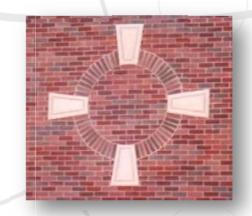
Thin Brick Precast Panel (API Manufacturer: www.apiprecast.com)
